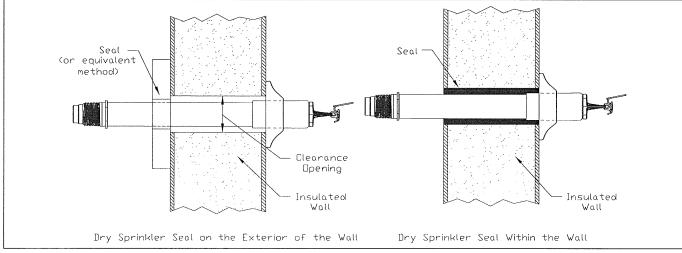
Dry Sprinkler Seal (Adjustable Standard Dry HSW Sprinkler is Shown)
